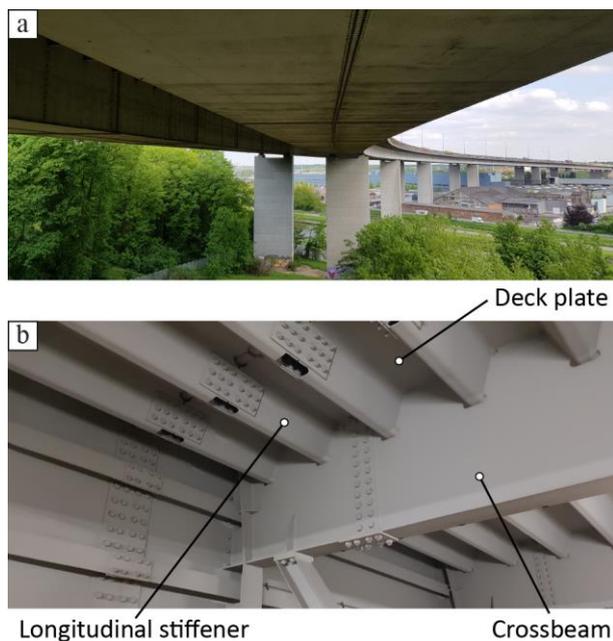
Viaduct of Vilvoorde. (a) Closed box girder seen from below; (b) OSD details inside the box girder
